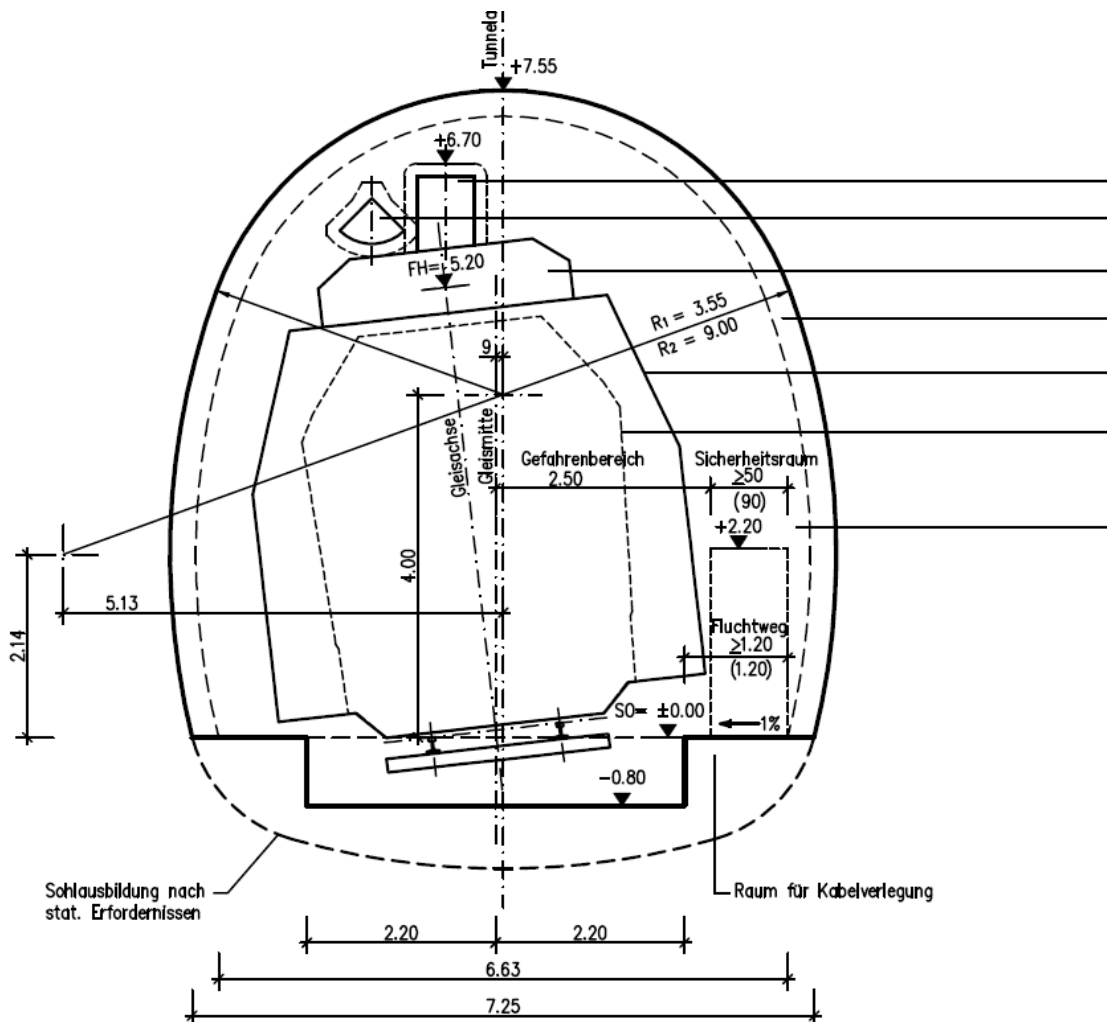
Example for Single Track Tunnel Section (Ril 853, Guideline of the DB AG)
